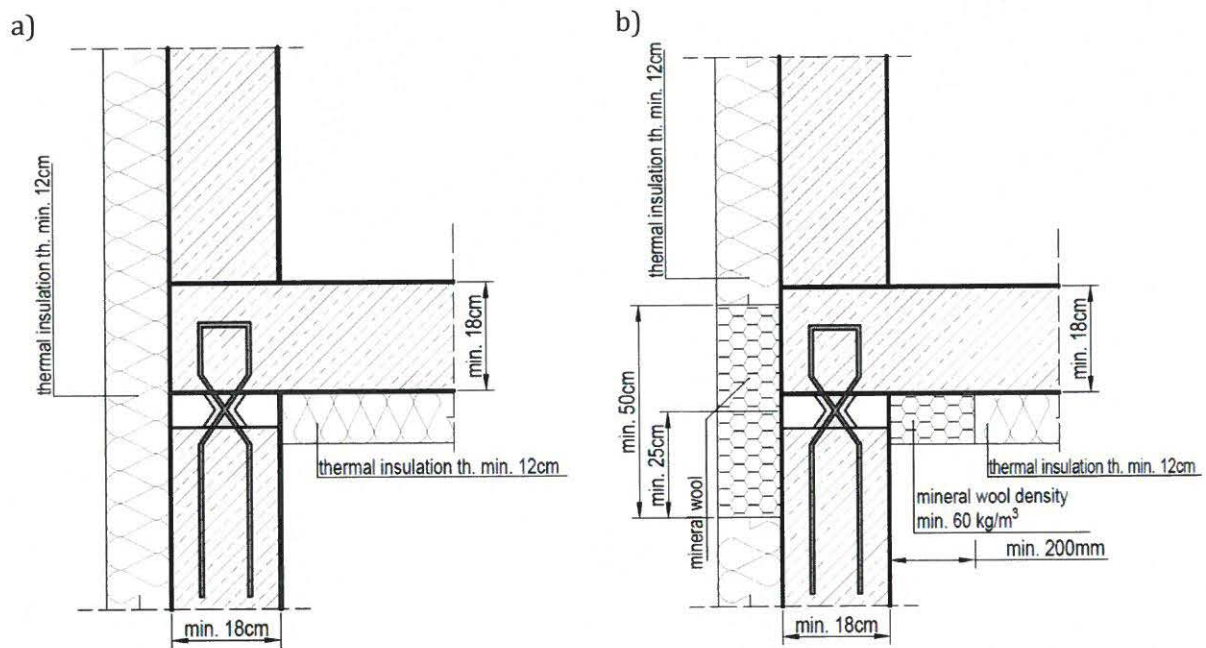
External wall and floor/flat roof connection with Schöck Alphadock / Sconnex Typ W
